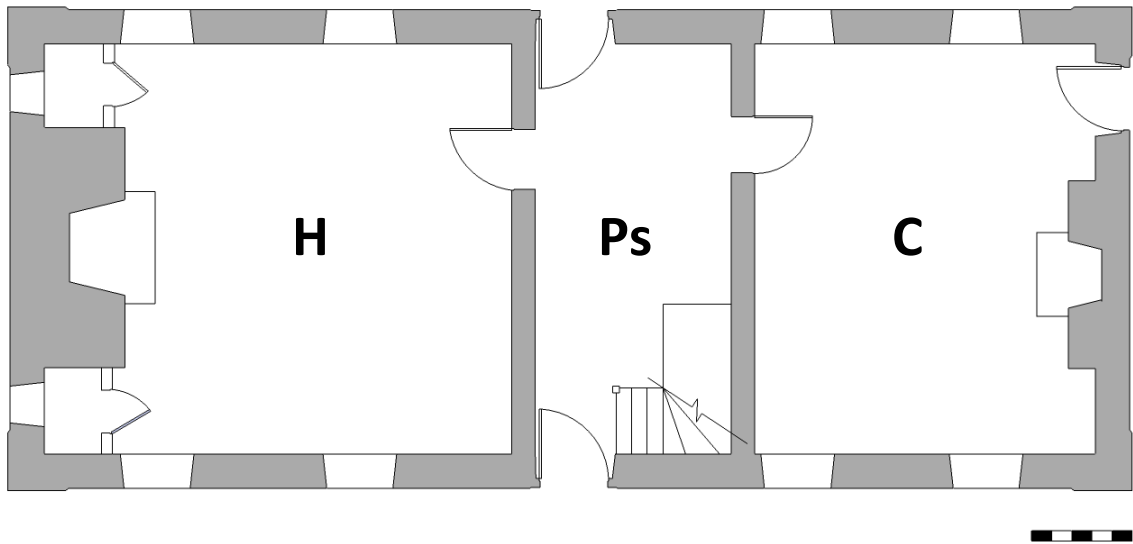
Ground-floor plan of Evergreen, Accomack County, built c. 1766-1772. Drawing by author.
